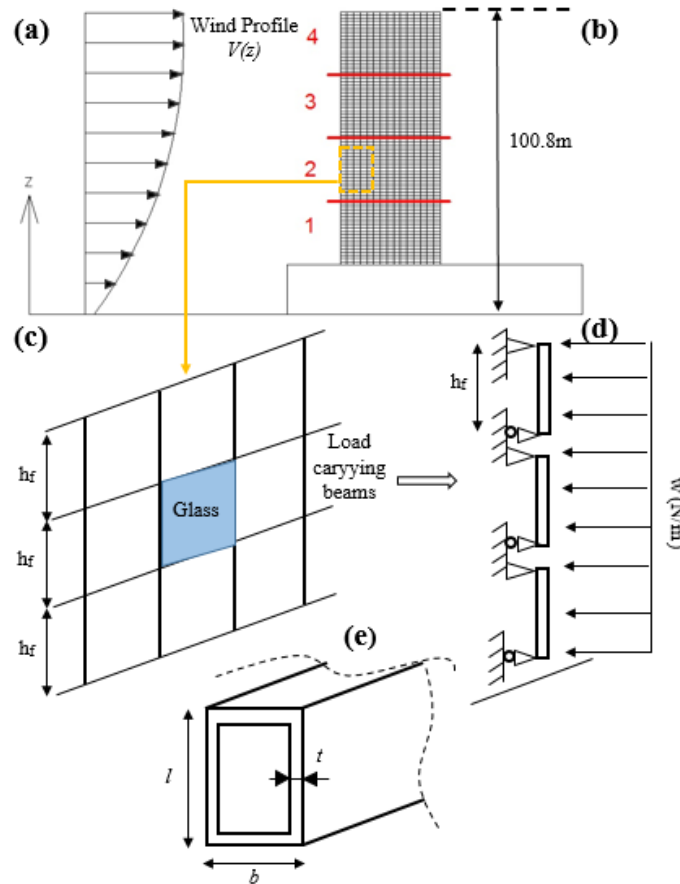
Schematics of parametric design for cladding structures, (a) Actual wind profile based on power-law, (b) Building with prescribed zones, (c) Load carrying beam structures with glass assembly, (d) Load carrying beams under wind load and (e) Cross-section of load carrying beams
